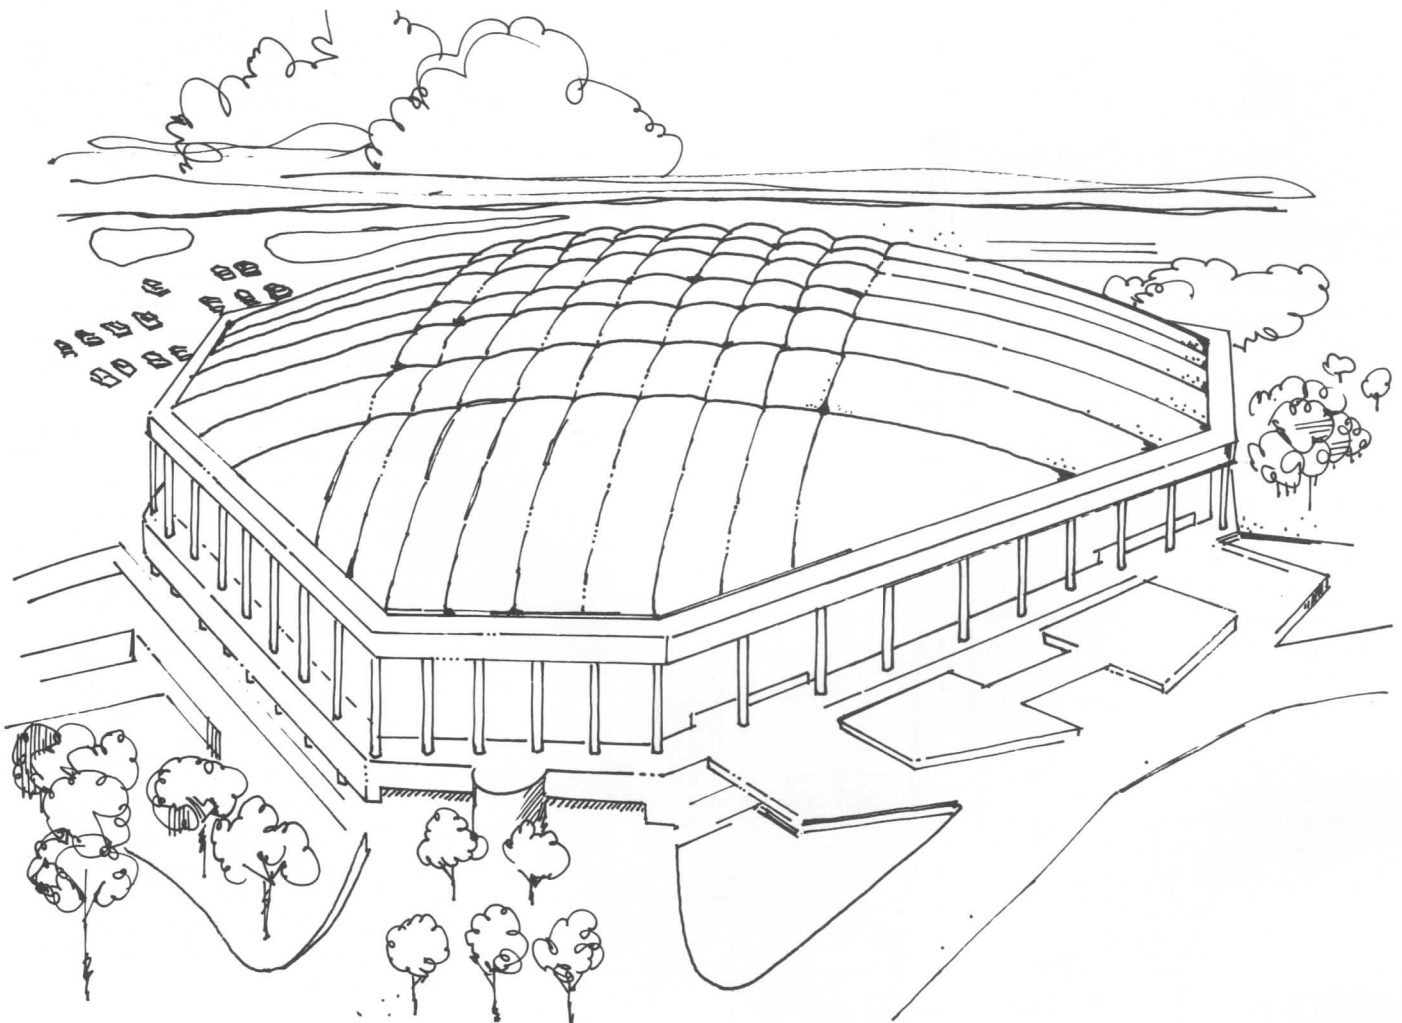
The Pontiac Silverdome in Pontiac, Michigan.
